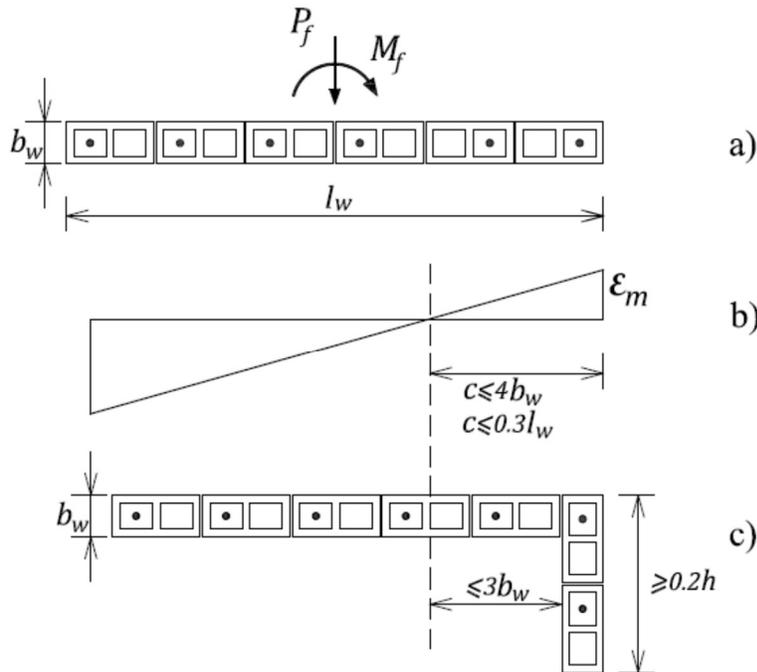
Compression zone restrictions related to wall slenderness: a) rectangular wall section; b) corresponding strain distribution and compression zone restrictions, and c) limits for the flanged wall sections.
